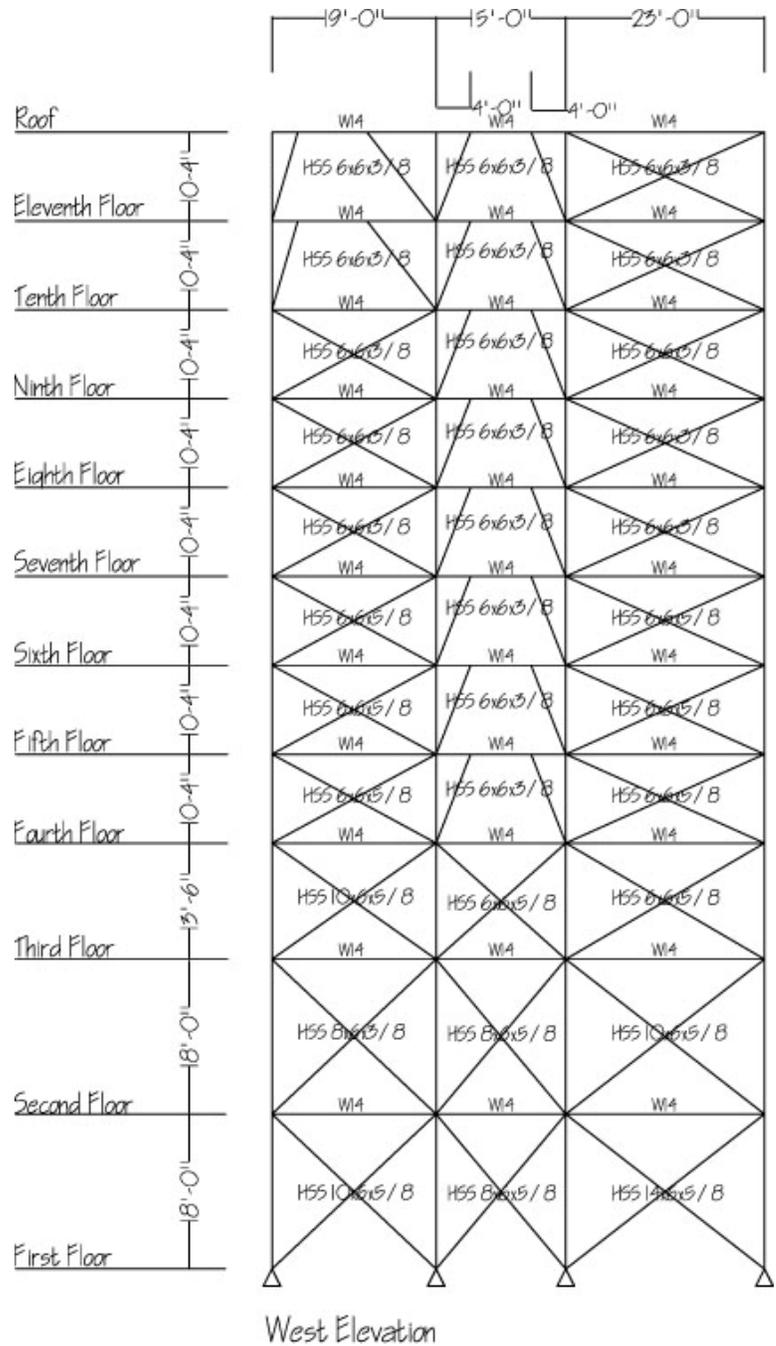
The West Elevation of the lateral bracing is shown here with the combination of diagonal cross braces, as well as eccentric knee braces. The first three floors on the West Elevation have all cross braces because of the attached parking garage. The East Elevation has eccentric knee braces to the ground which allows for the ribbon window to be carried down through the first three floors.
